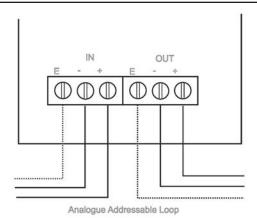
IP66 Wall Sounder Wiring CAS381WP
